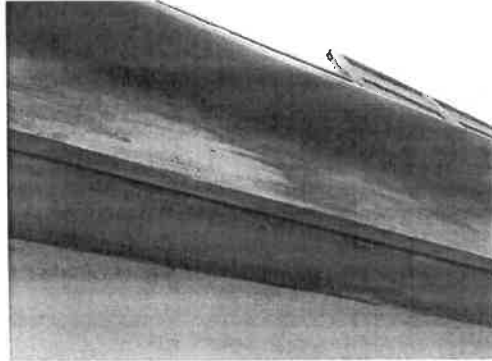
Soffit and soffit box which extends along the front (south) of the outbuilding
